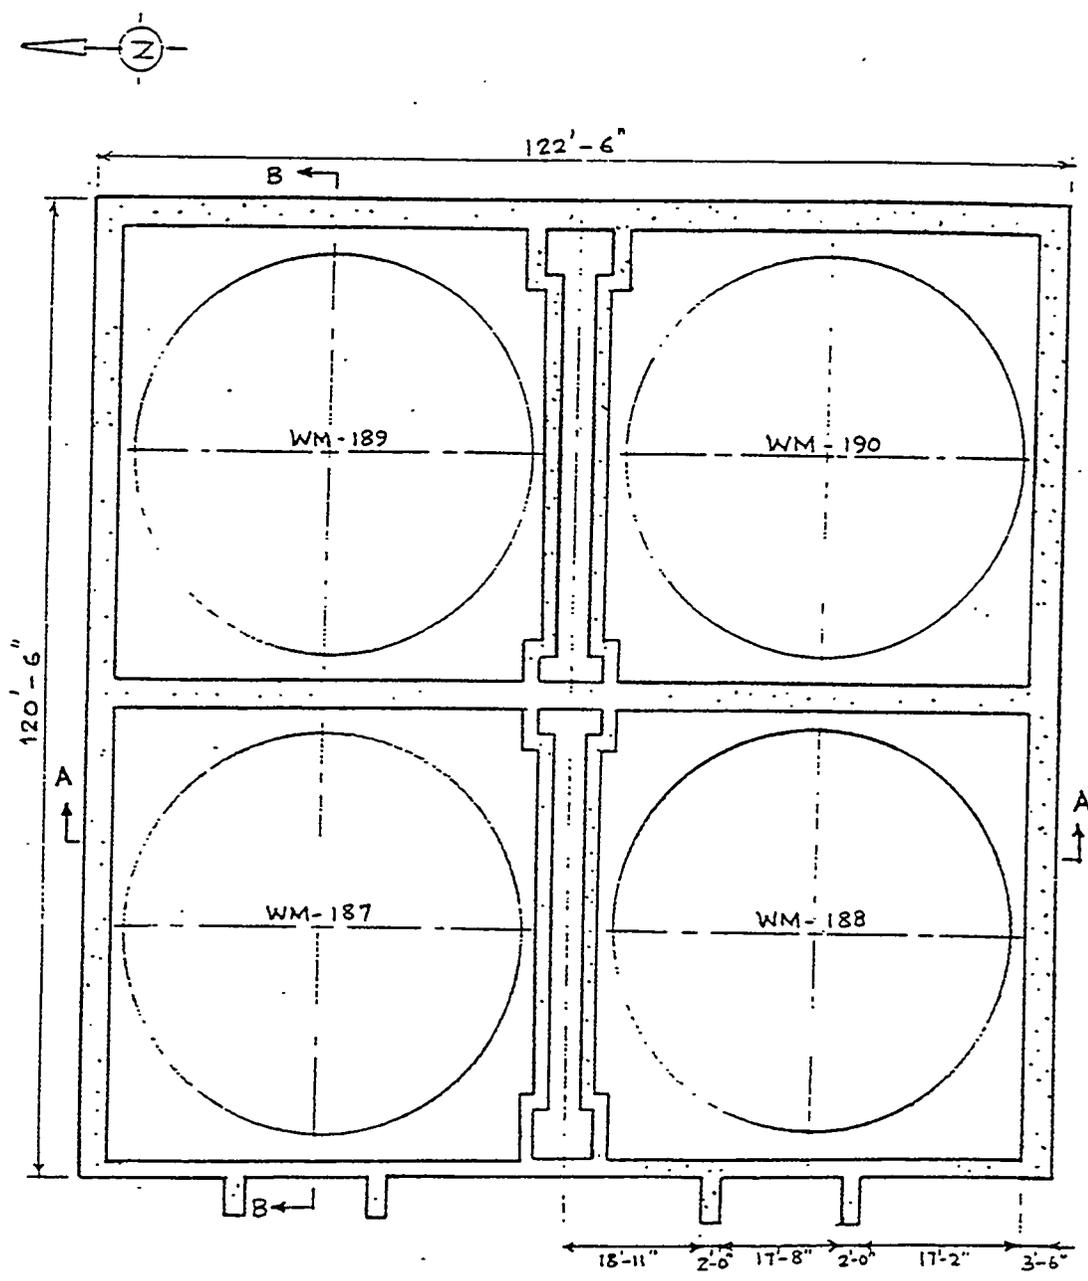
PLAN VIEW OF VAULT CPP-713
